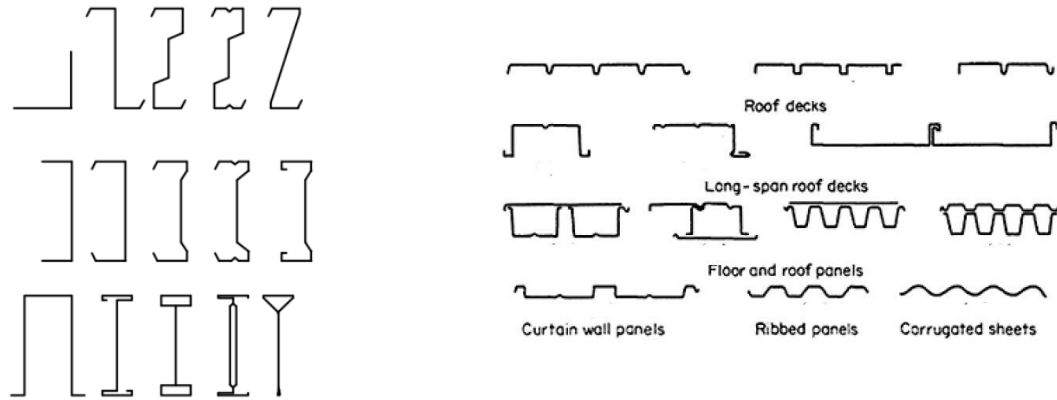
Cold-formed a) structural member b) Sheeting member
